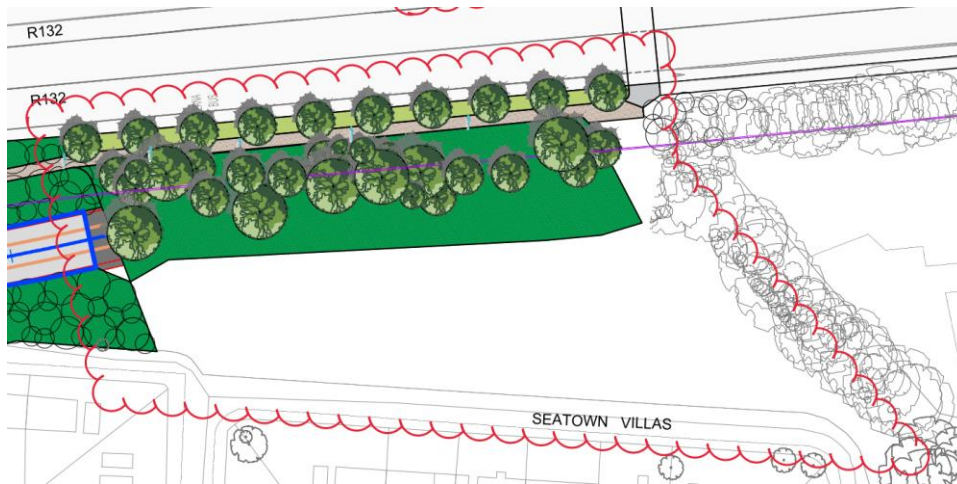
Amended Landscaping Proposals at Seatown Villas if Boundary Wall and Landscaping is Reinstated as Existing
